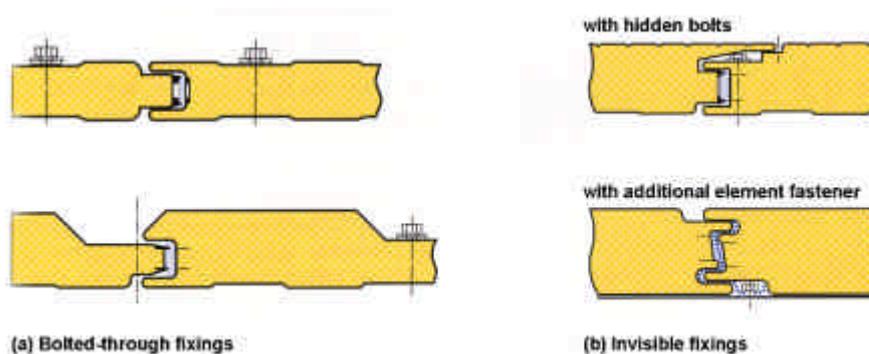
Examples for the construction of fixings for walls made of sandwich panels, [4]
